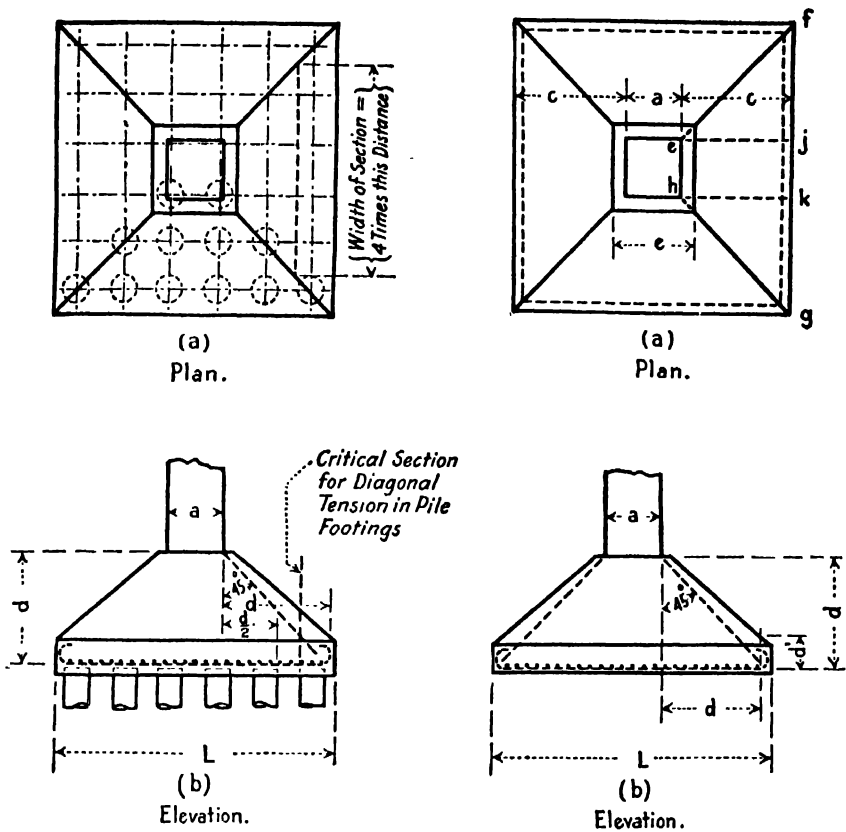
Typical sloped reinforced concrete footing on piles. FIG. 17.—Typical sloped reinforced concrete footing on soil.
